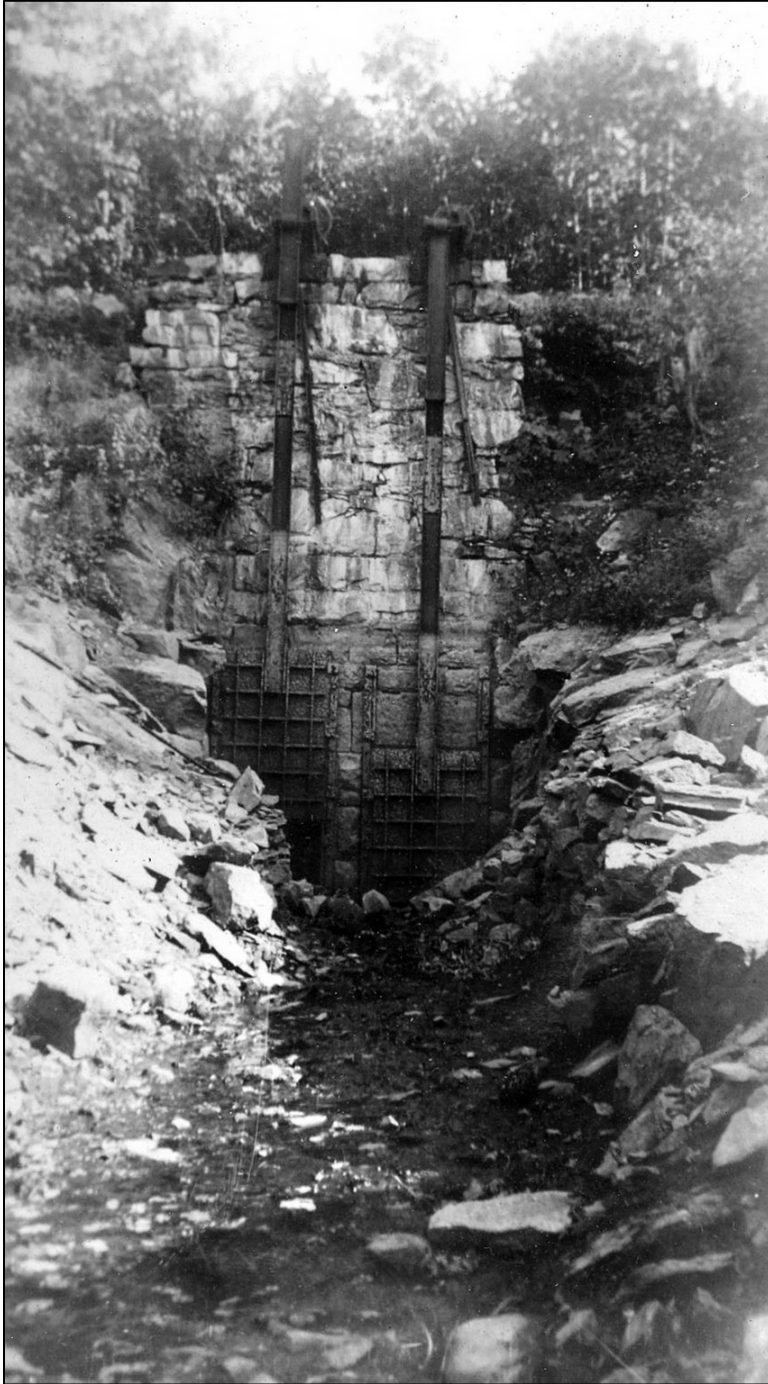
Gilbert Tunnel Inlet gates, ca. 1935 (courtesy Dave Battista, Lenard Engineering, Winsted, CT).
